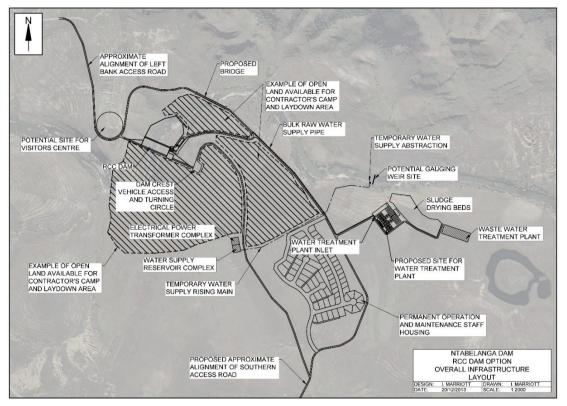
General Layout of the Proposed Dam and Associated Works
